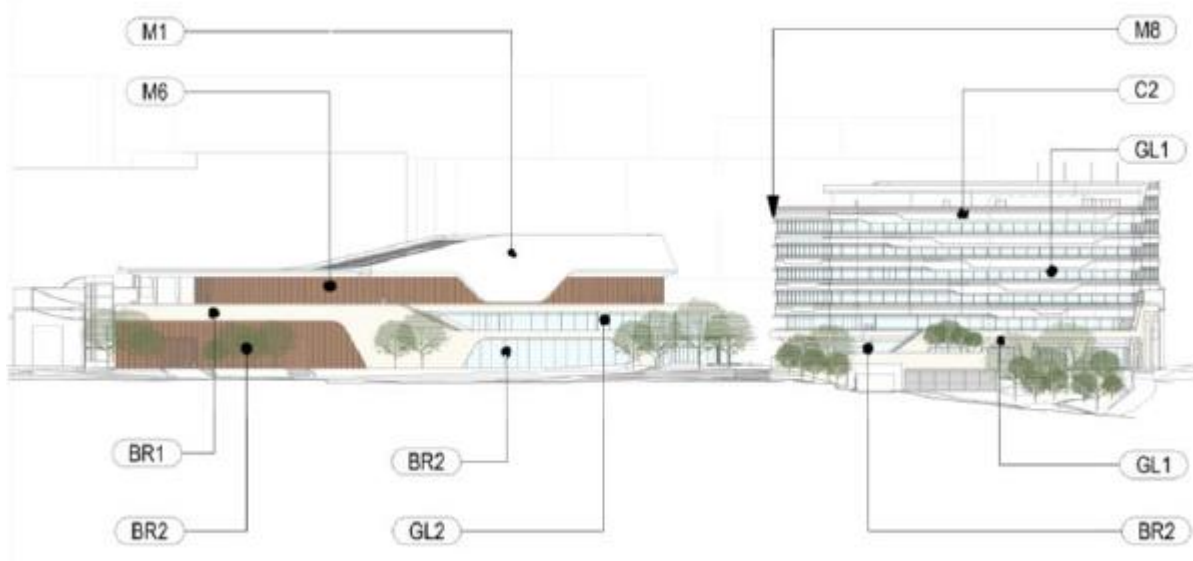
Proposed elevation showing location of “M1 – Metal sheet – Dulux Duratec Powdercoat Zeus Whitegloss” on the community hall building
